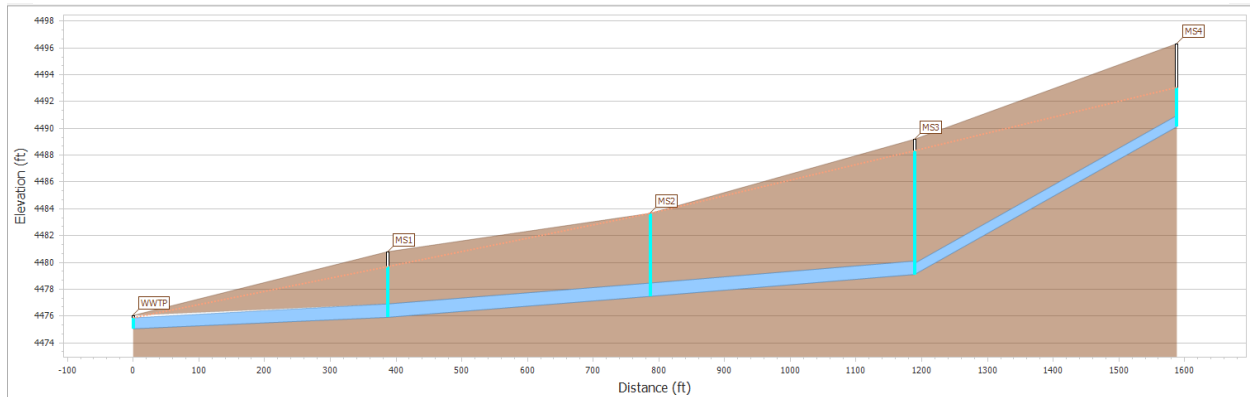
Main Street Trunk Phase 1 – Master Plan HGL
